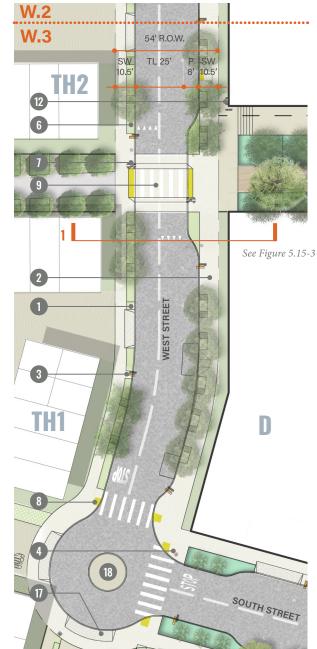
West Street, Site Plan W.2 & W.3
